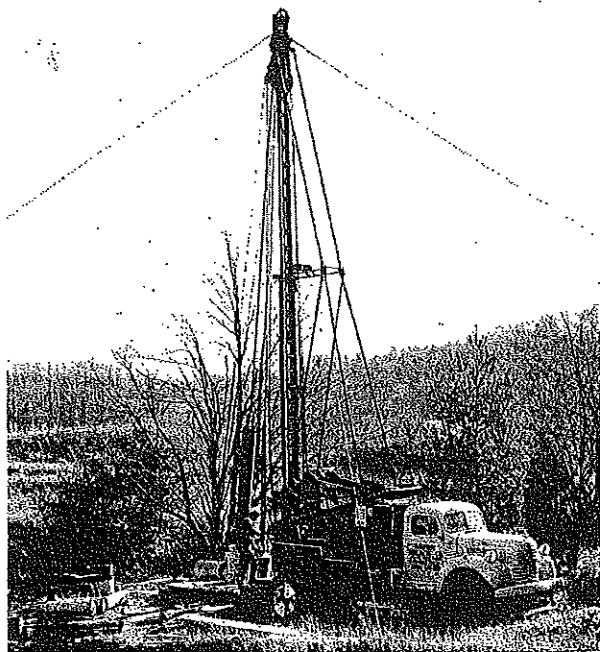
Speedstar Model SS-71 Cable Tool Drill
